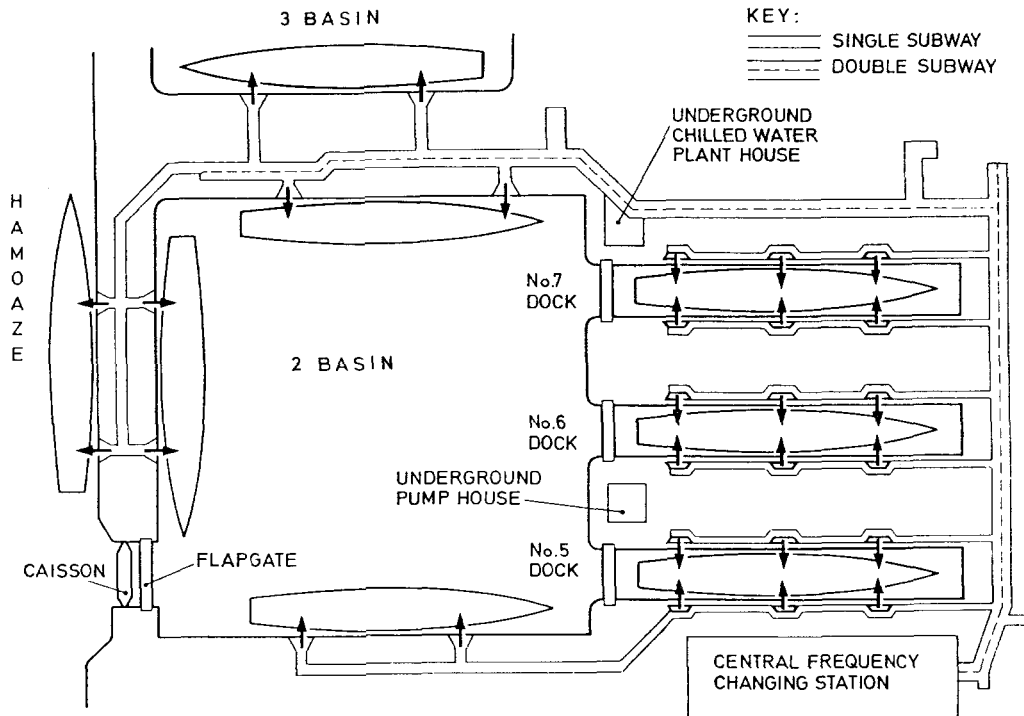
SUBWAY SYSTEM SHOWING SERVICE OUTLETS AROUND DOCKS AND BERTHS
